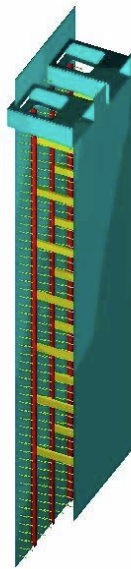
A Typical Steel-Concrete Structural Module Used in the AP-1000
